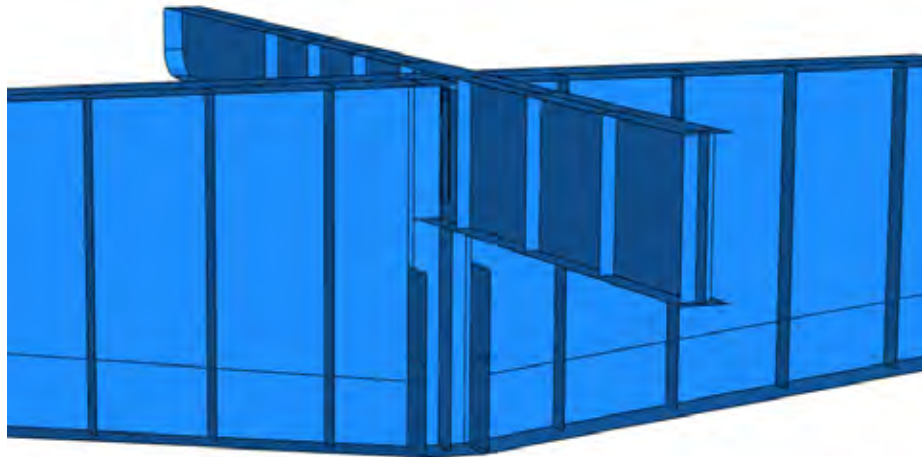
View from Finite Element Model Showing Retrofit Bearing Stiffeners
